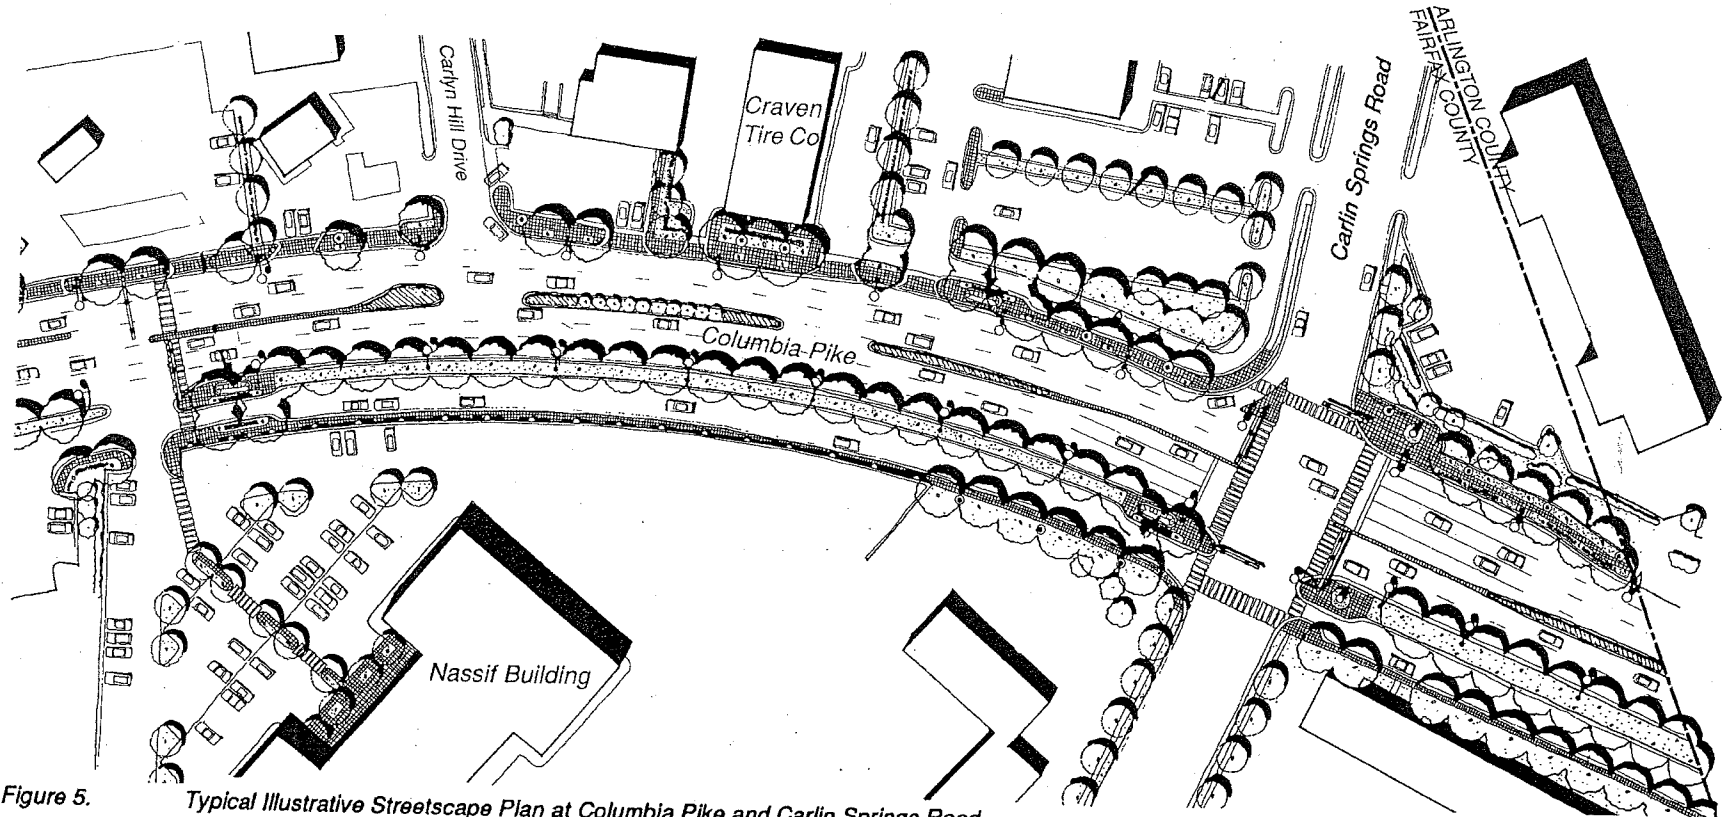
Typical Illustrative Streetscape Plan at Columbia Pike and Carlin Springs Road.
